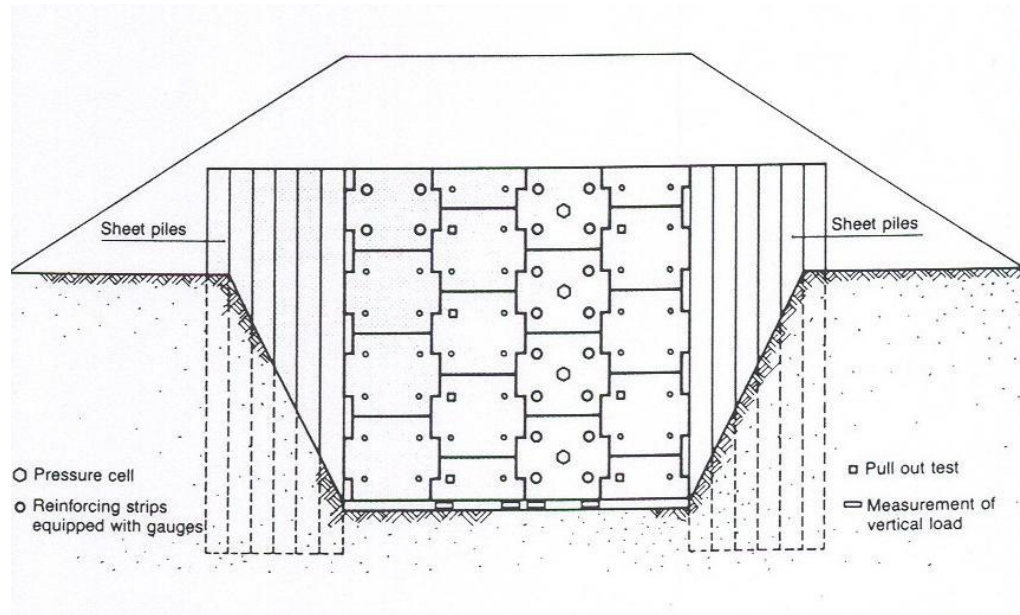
PWRI wall in Japan (Reinforced Earth, 1989)
